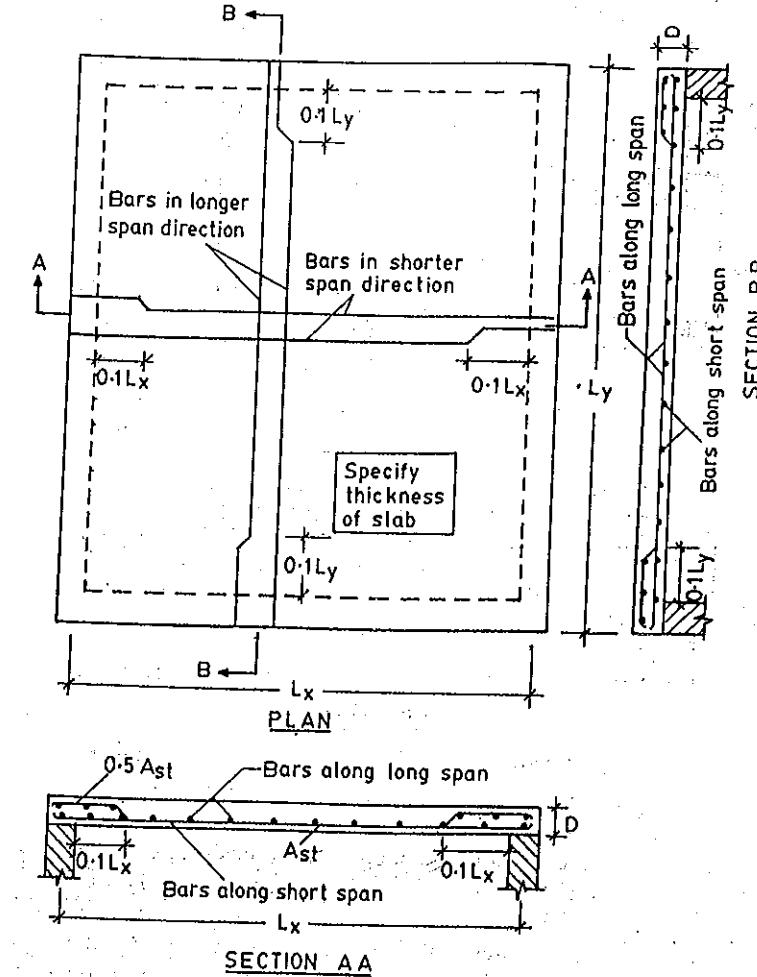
Typical Detailing in Two Way Slabs (SP-34)
